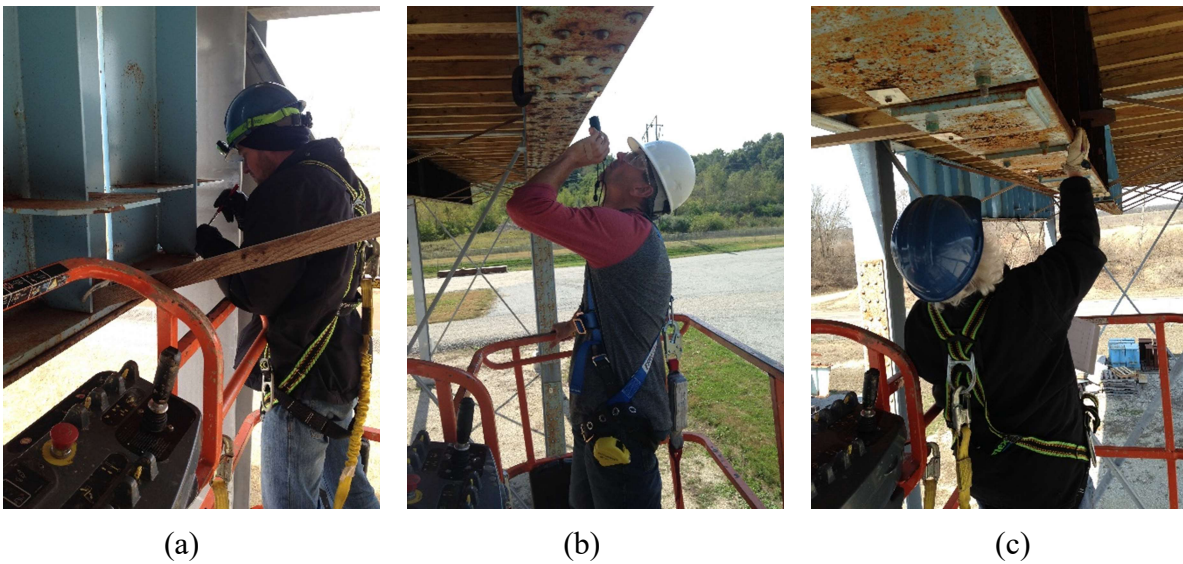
Hands-on inspection of the (a) girder, (b) overhead mounted riveted plate, and (c) welded cover plate specimens
